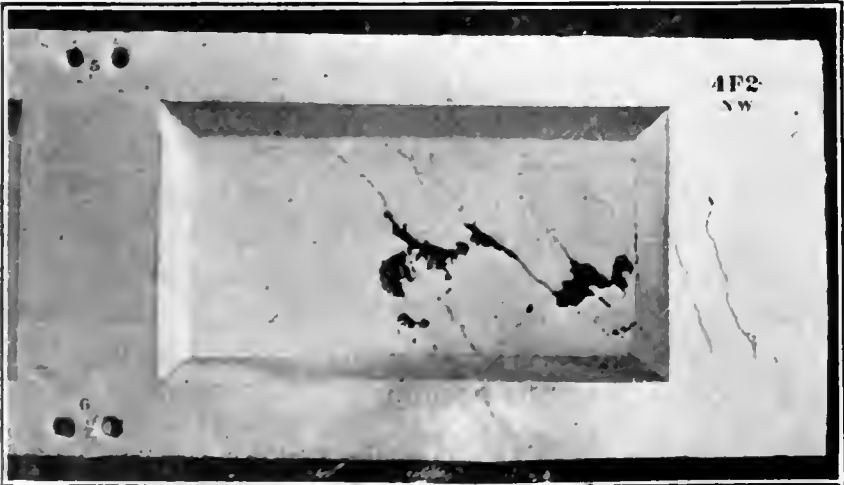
SHEAR CRACKS IN BEAM UNDER MAXIMUM LOAD
